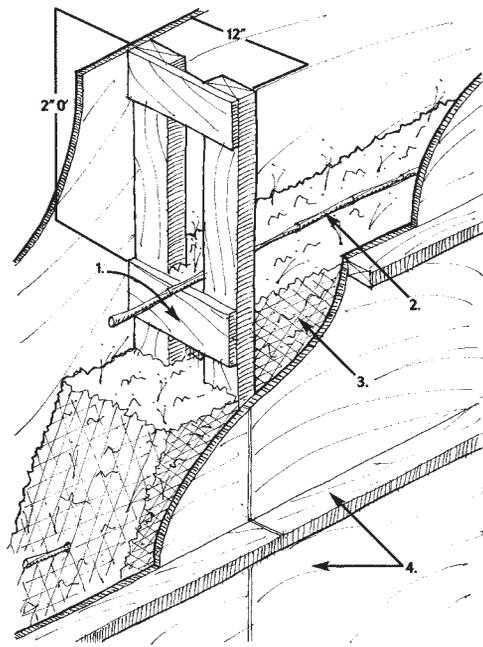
Clay-straw tamped between temporary plywood formwork attached to 12-in.-deep frame wrapping exterior of timber frame.
